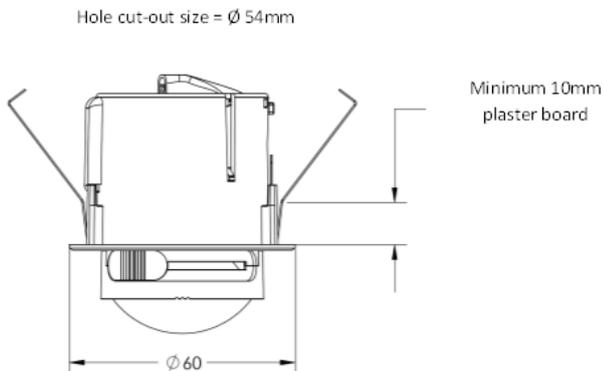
Installation cross section of sensor head installed in plasterboard ceiling or ceiling tile.
